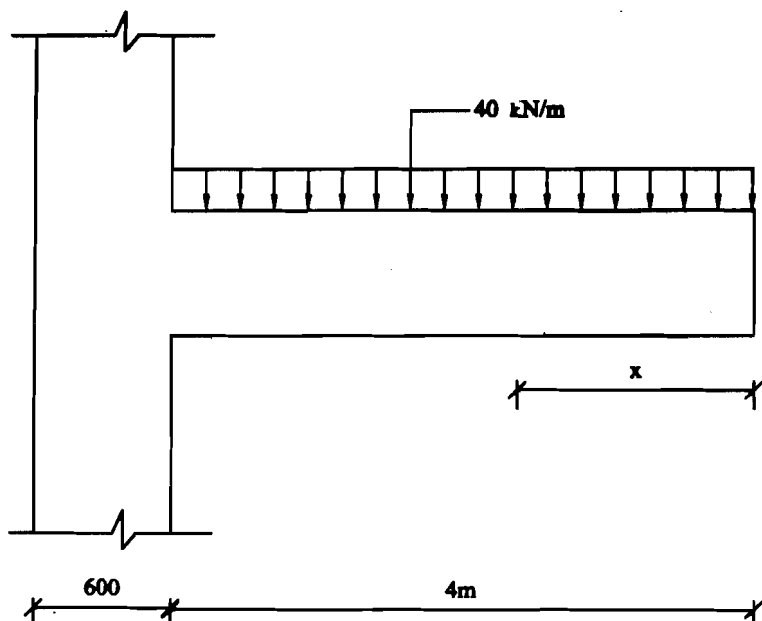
A Cantilever Beam Projecting from a RCC Column
